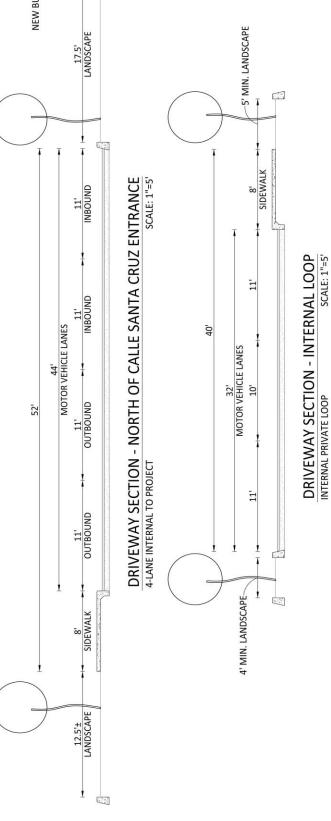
CONCEPTUAL CROSS SECTIONS OF PROPOSED ROADWAY NOT TO SCALE
